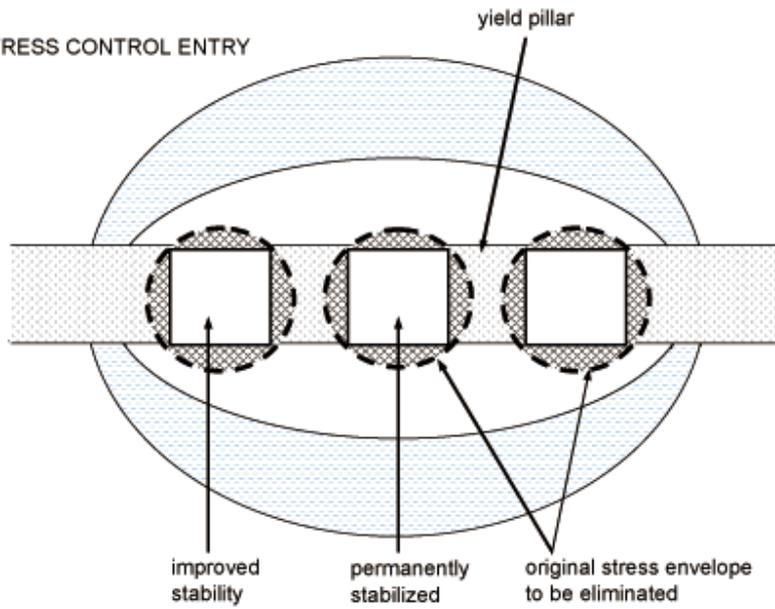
Formation of permanently stable "second stress envelope" designed to stabilize failing mine openings by grouping them with narrow yielding pillars
